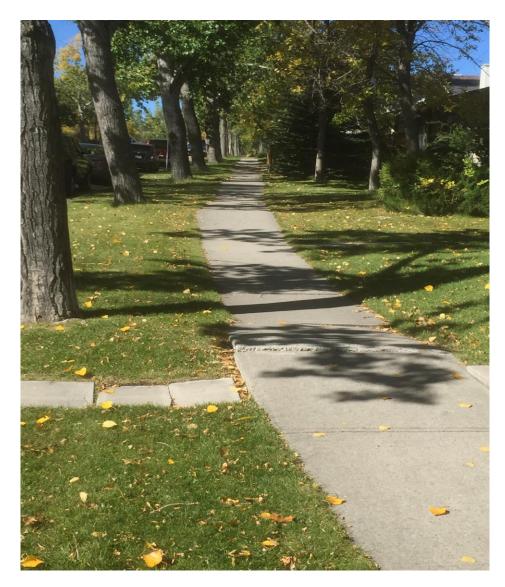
Photo Showing Multiple Tree Root Issues Within One Block Face
